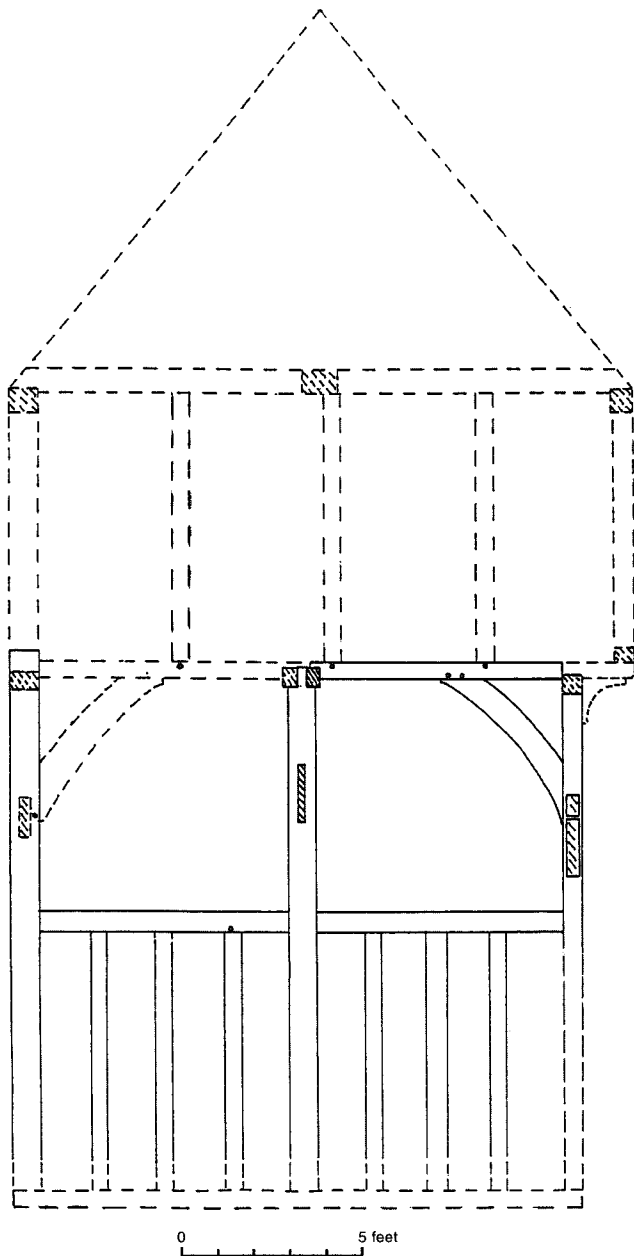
No. 3 Queen Street, the frame flanking the carriage arch, between trusses 2 and 3.
